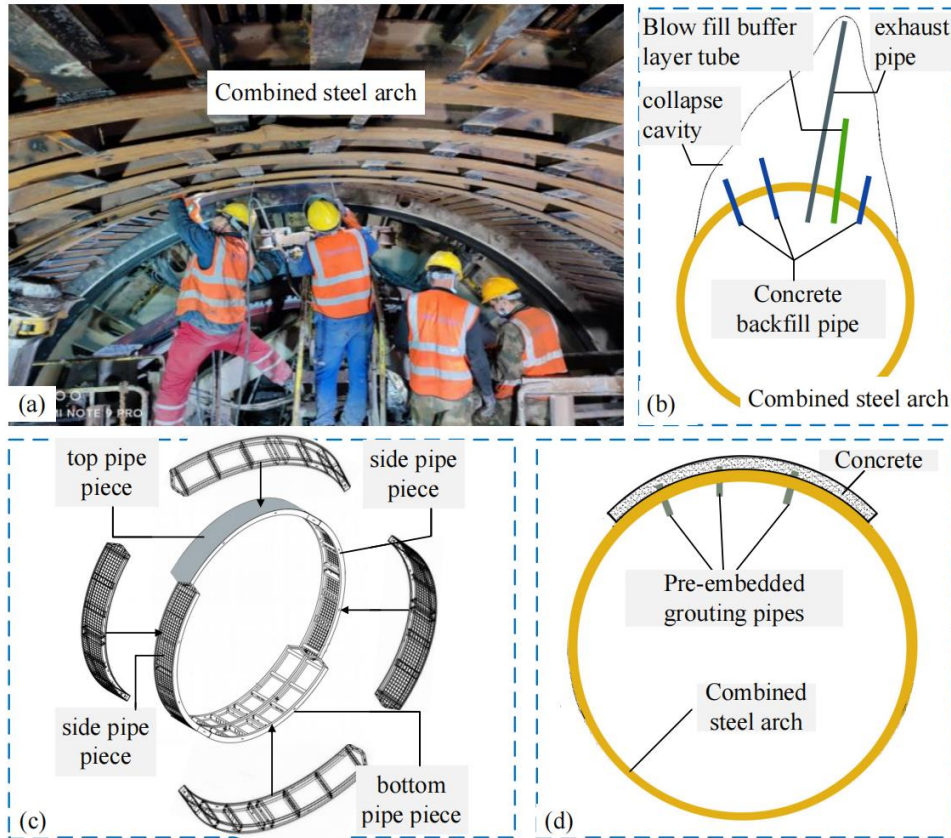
(a) Combined steel arch construction site; (b) layout of pre-buried pipes ;(c) combined steel arch construction program diagram; (d) concrete backfill schematic
